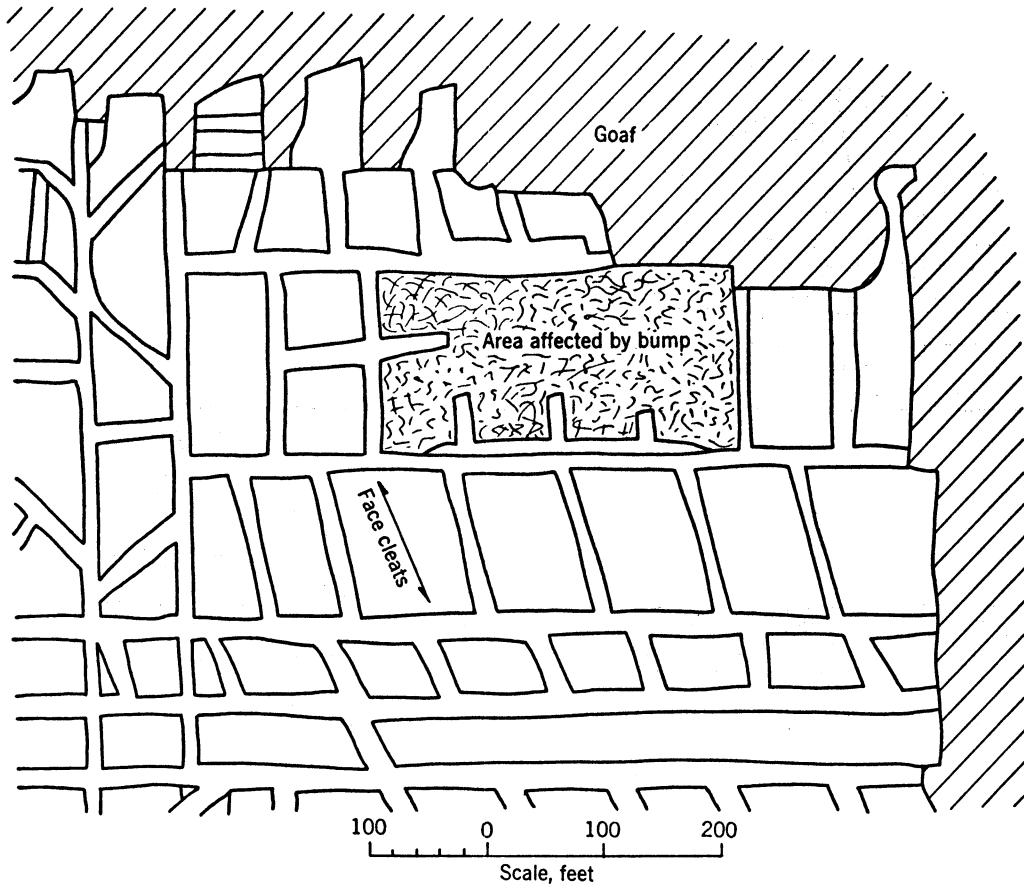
Bump on a Pillar-Line Point Where Development Work Was Being Done in a Highly Stressed Abutment Area; 4 Working Places Were Destroyed by 1 Bump.
